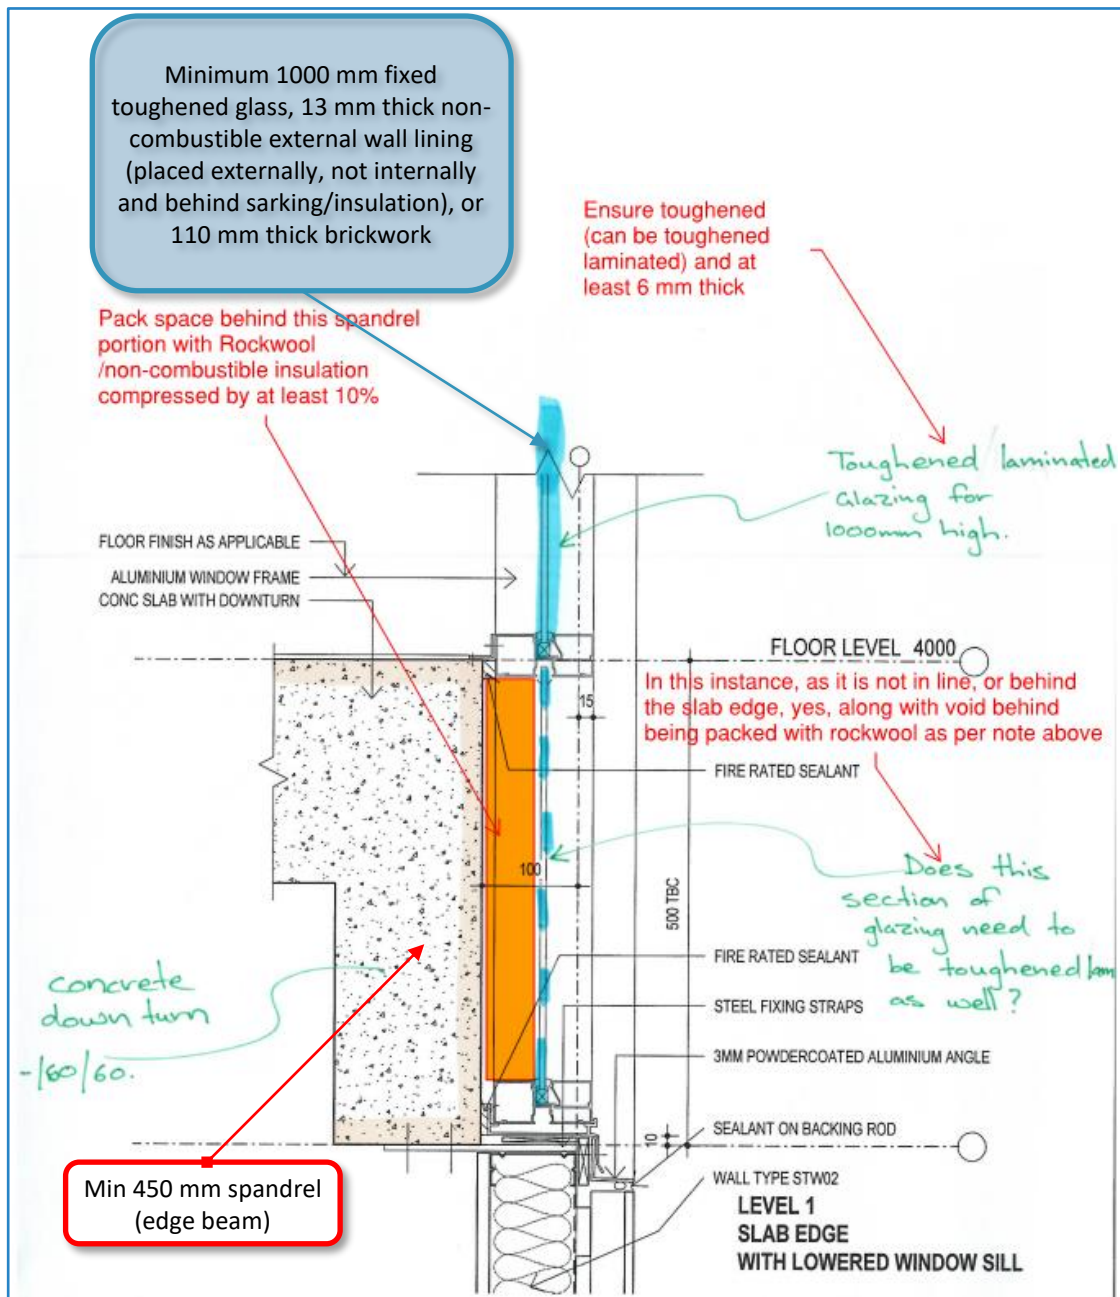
Example of proposed spandrel separation (For Block A being of conventional construction with concrete slab and set down)
